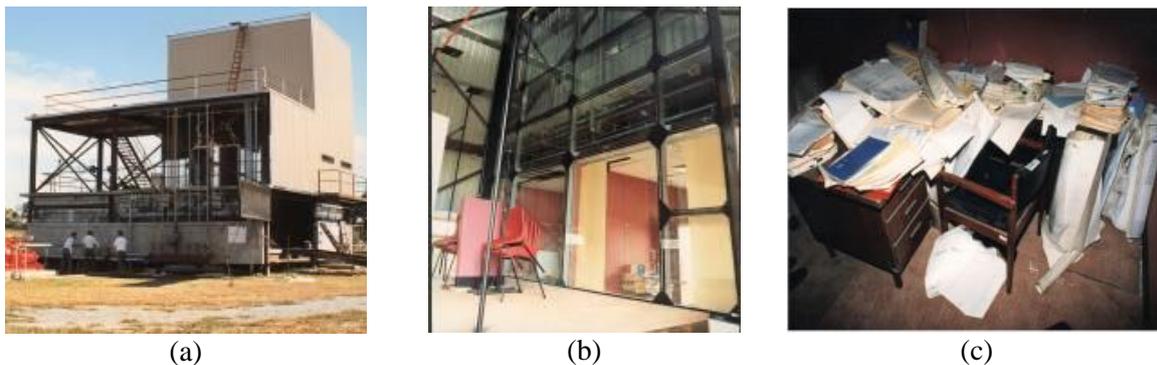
Photos of Capita Façade tests (a) Exterior to test structure as viewed from East, (b) Office set up adjacent to the façade and (c) Typical fire load
